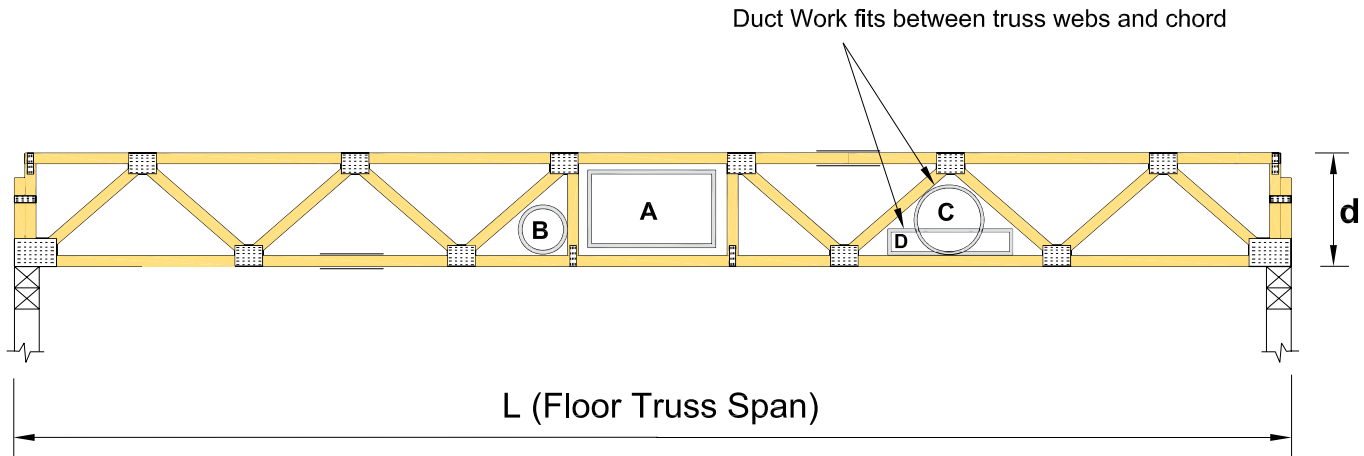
Typical 4 x 2 floor truss configuration with mechanical chase opening located near truss mid-span.
